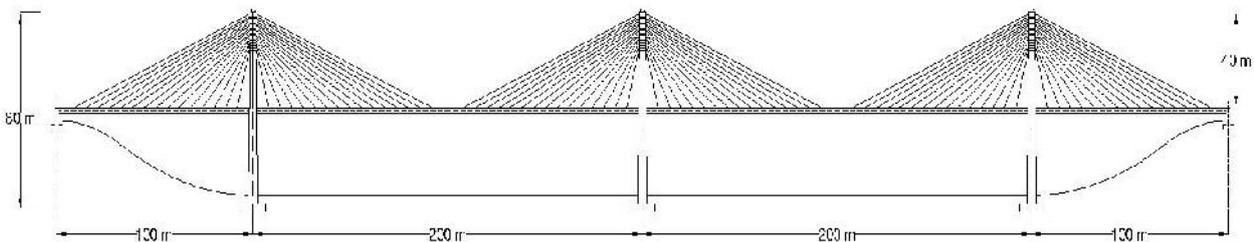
Fan type stay cable profiles used in manually design of cable stayed bridge
